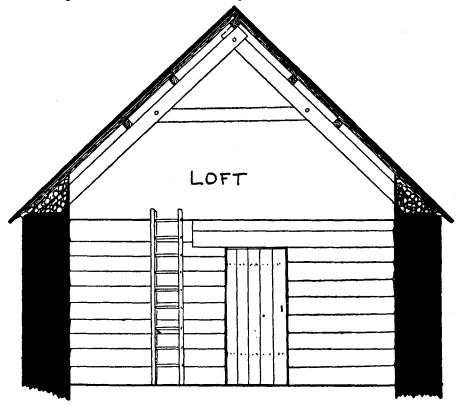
LLAIN-WEN-ISAF: cross-section, line B-B on Plan. Scale as Fig. 2
